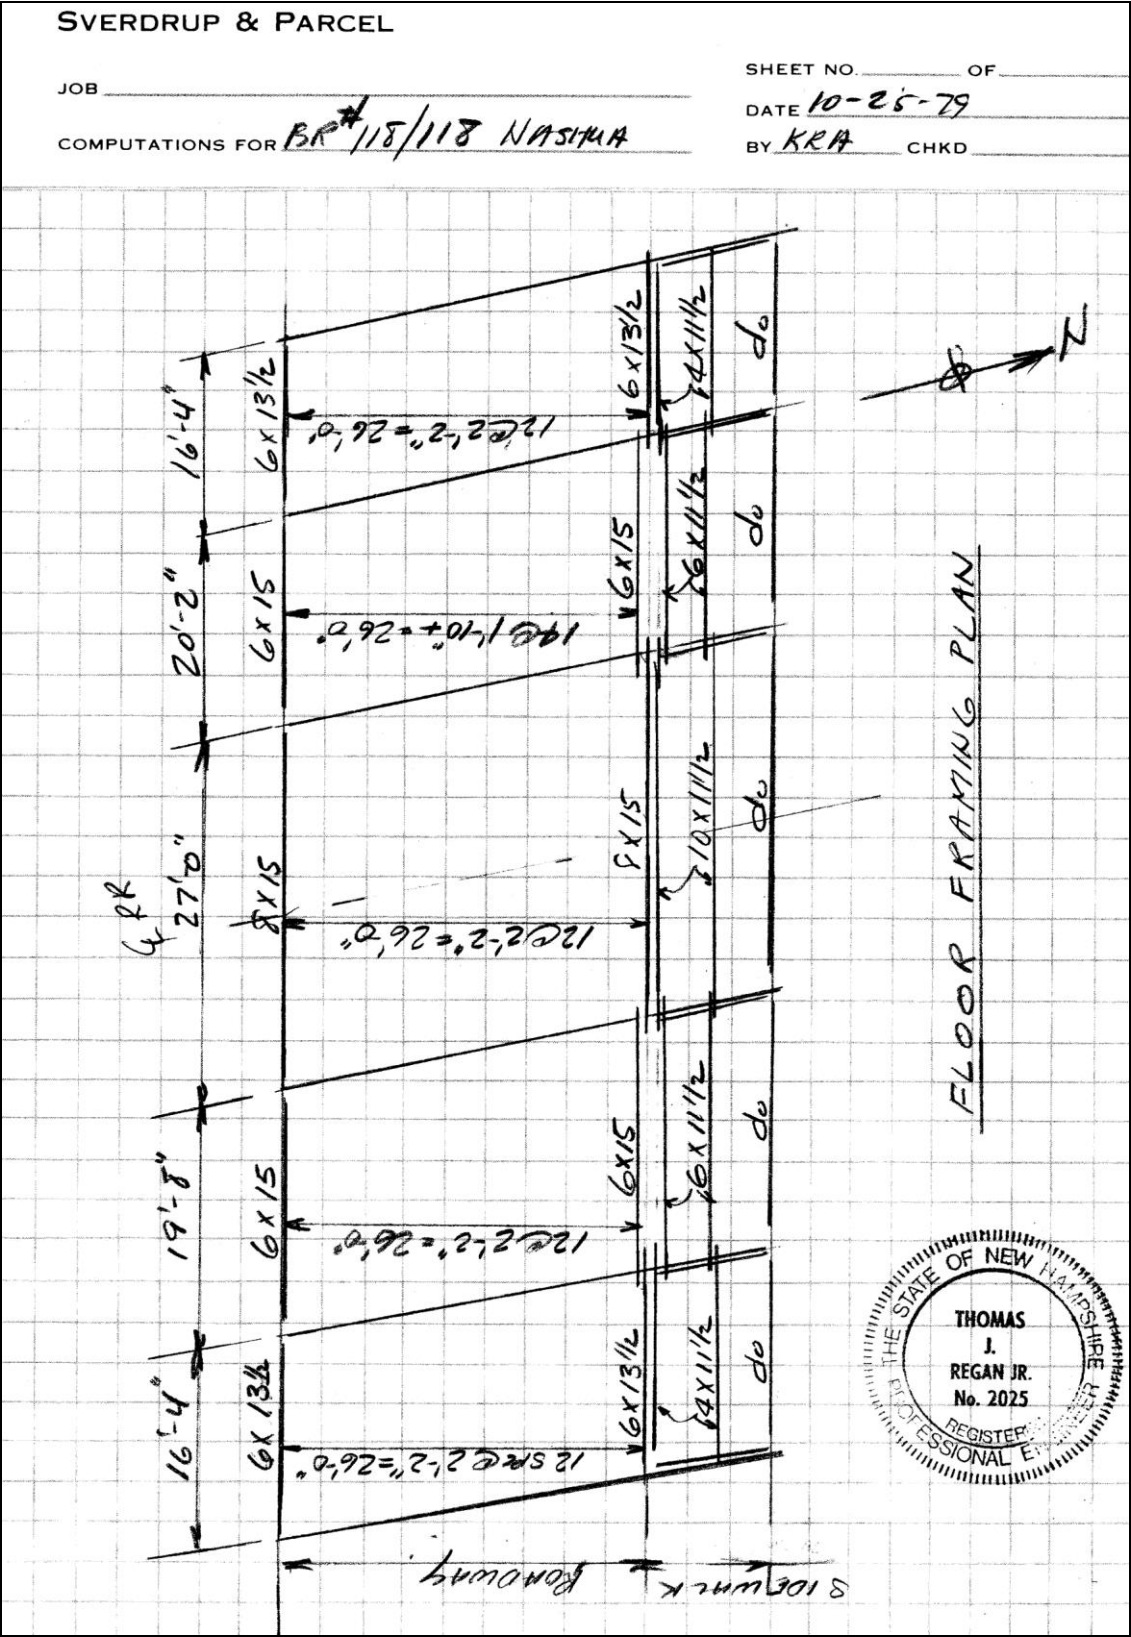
Fairmount St. Bridge Engineering Inspection Sketch by Thomas Regan, Jr. CE, Sverdrup & Parcel Engineers, October 1979 (NHDOT Bridge Inspection File).
